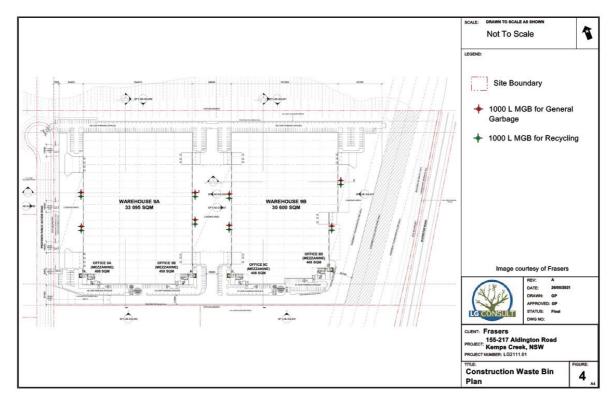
Construction Waste Bin Plan (Source: LG Consult 2021)
